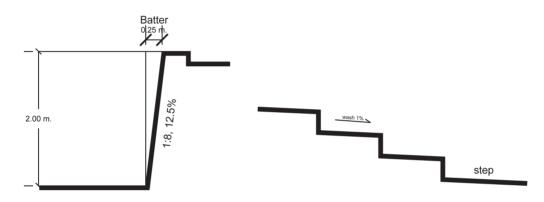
The cross section showing the batter distance of a retaining wall soil (left) and the wash slope of steps (right)
